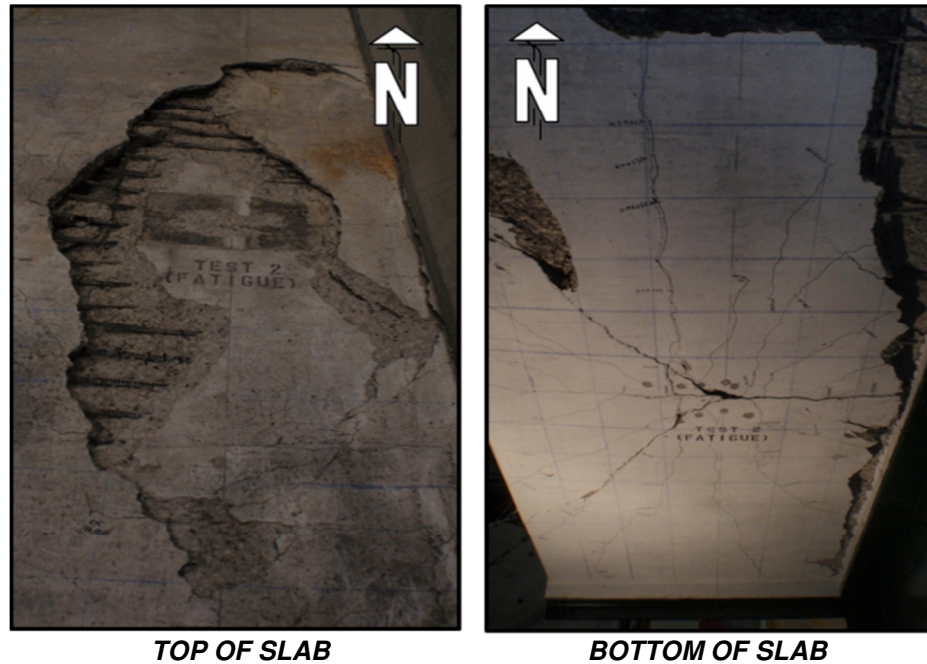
Photographs of the top and bottom views of punching shear type failure for the cantilever section with steel reinforcement subjected to a fatigue cyclic load
